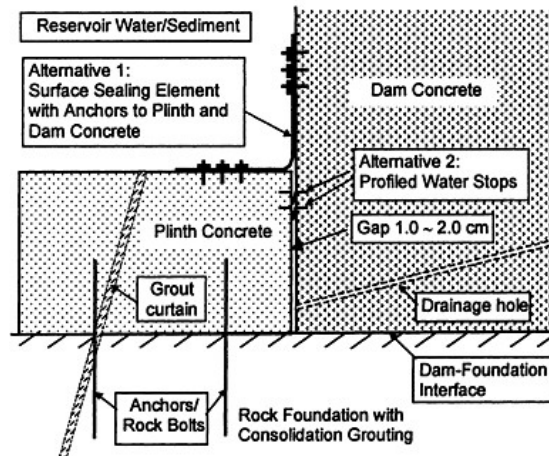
Concrete plinth/platform structure with sealing elements and anchors.
